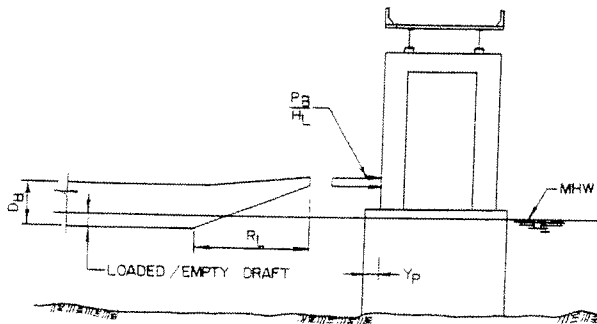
Barge Impact Force on Pier.
